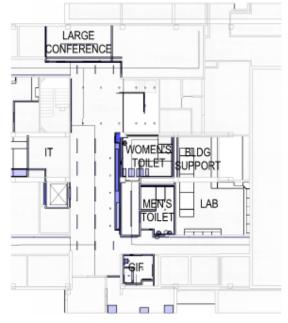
Phasing Diagram New Floor Plan, Level 2
